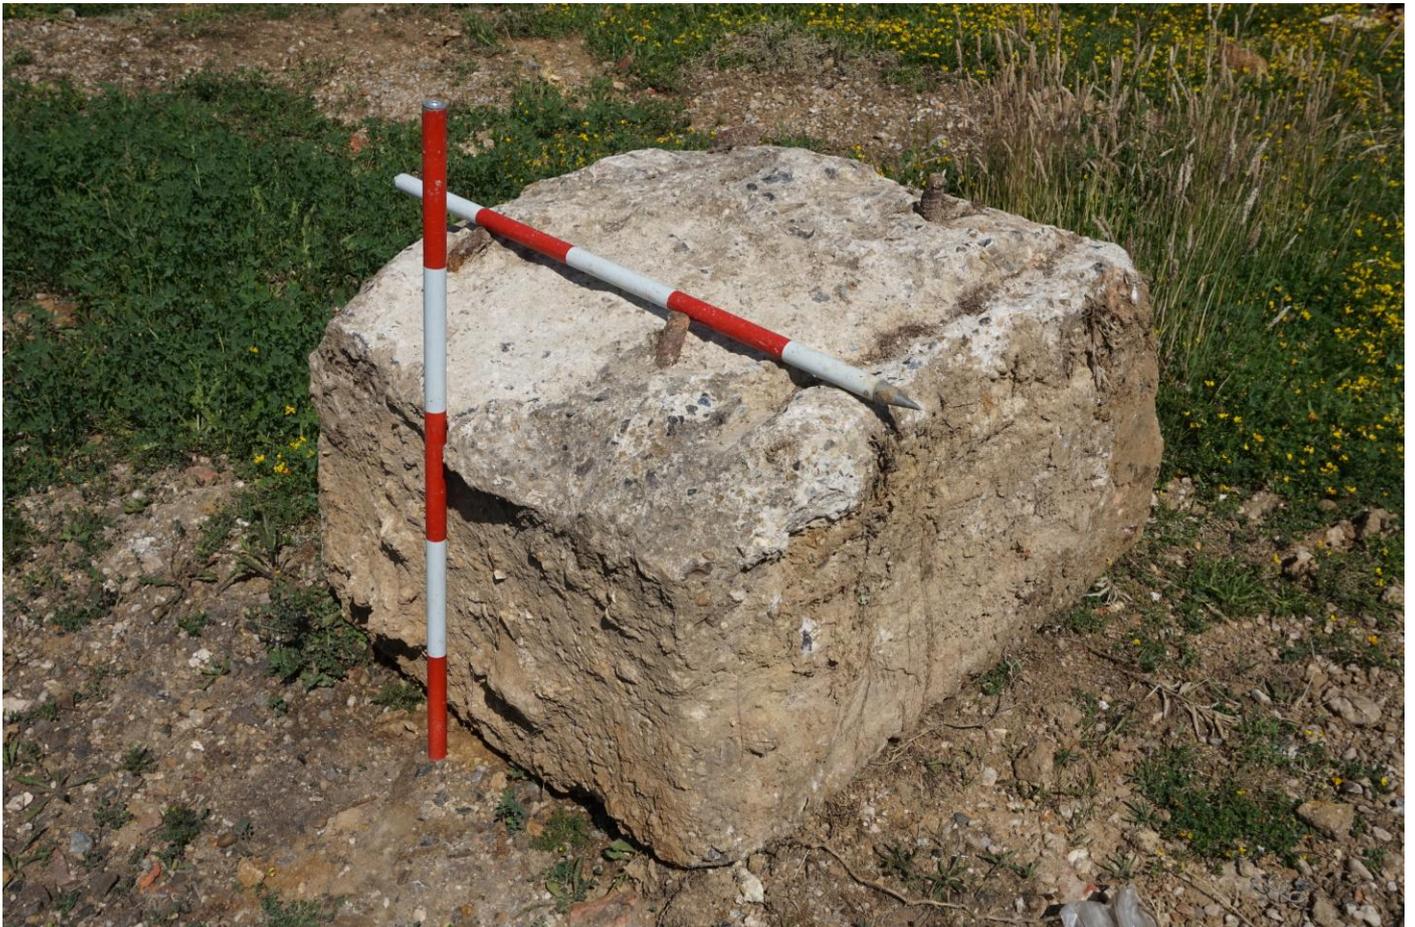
Concrete foundation for the column removed from trench 12. This type of structure was also exposed in trench 8 and 14
